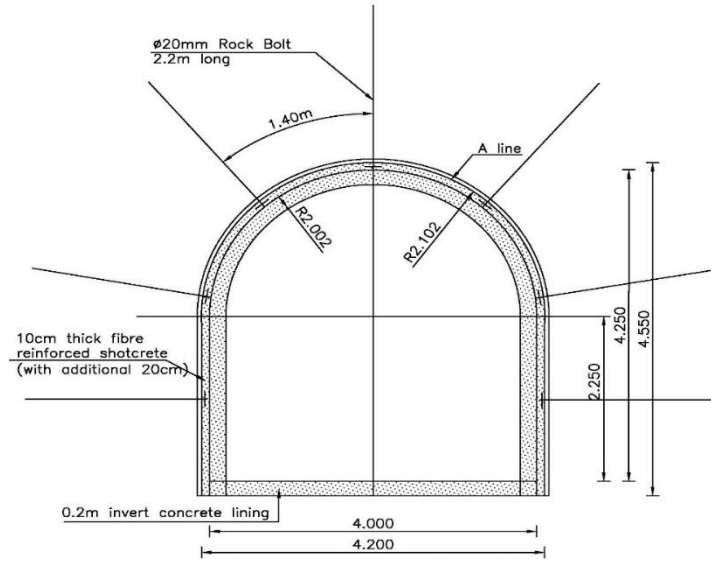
Final Concrete Lining for Chainage 1+118 m to 1+142 m
